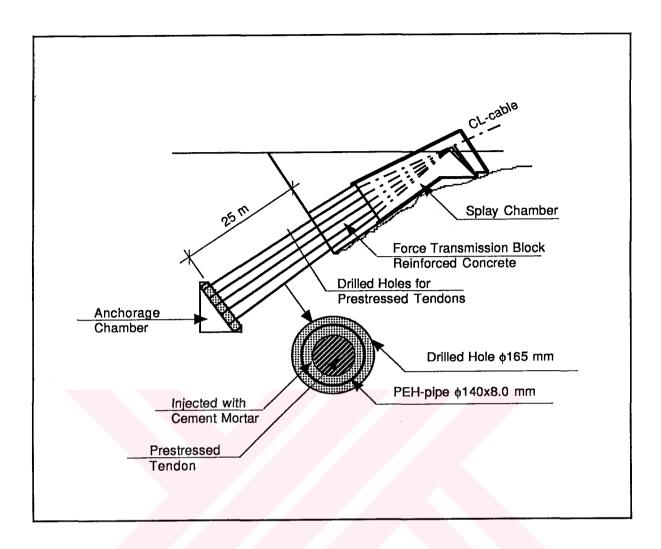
ANCHORAGE OF MAIN CABLES
